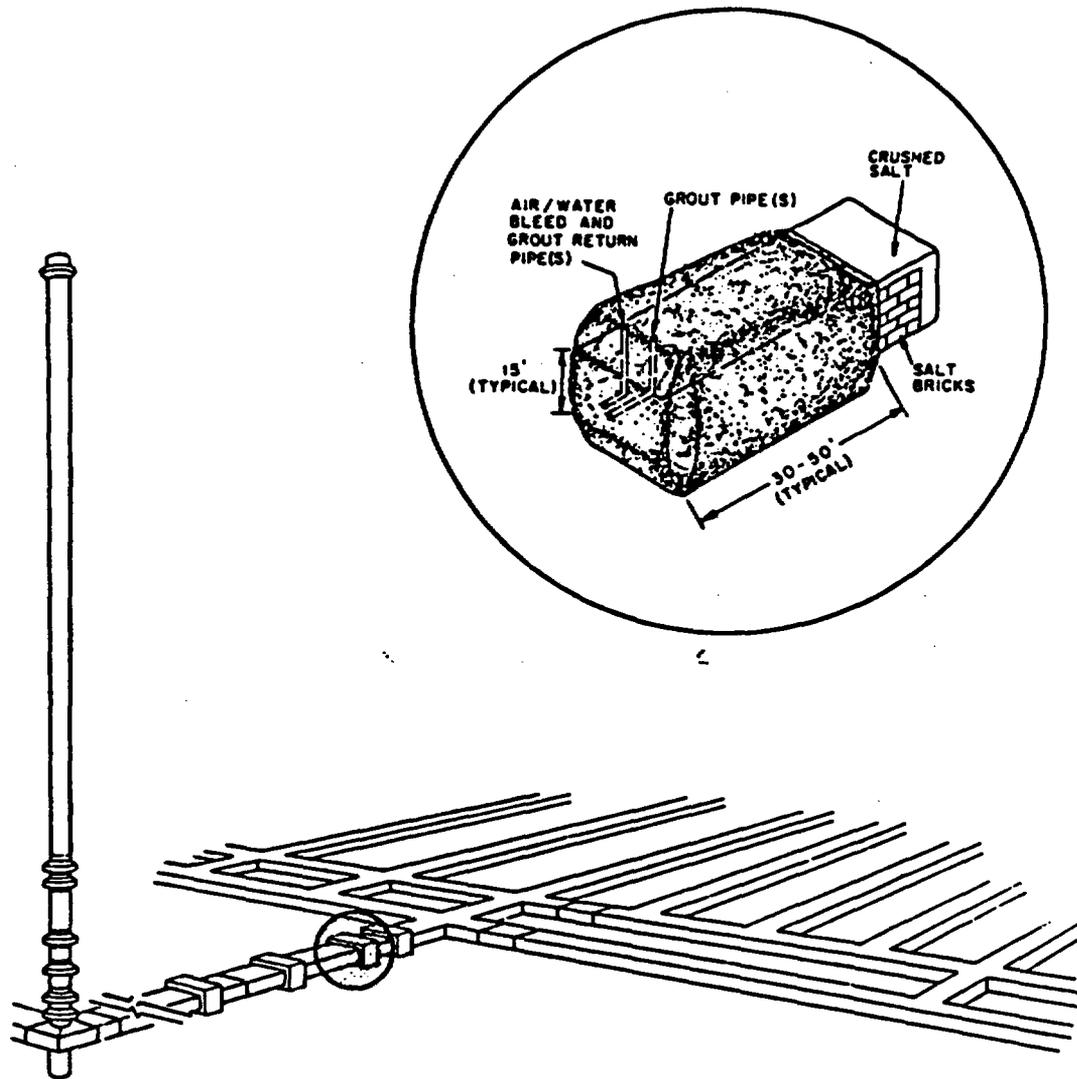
Concept for Concrete Tunnel Bulkheads
